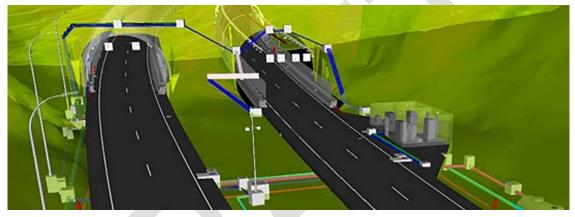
BIM model from a tunnel renovation project in N-644 Spain (Dair Engineering, 2019)
